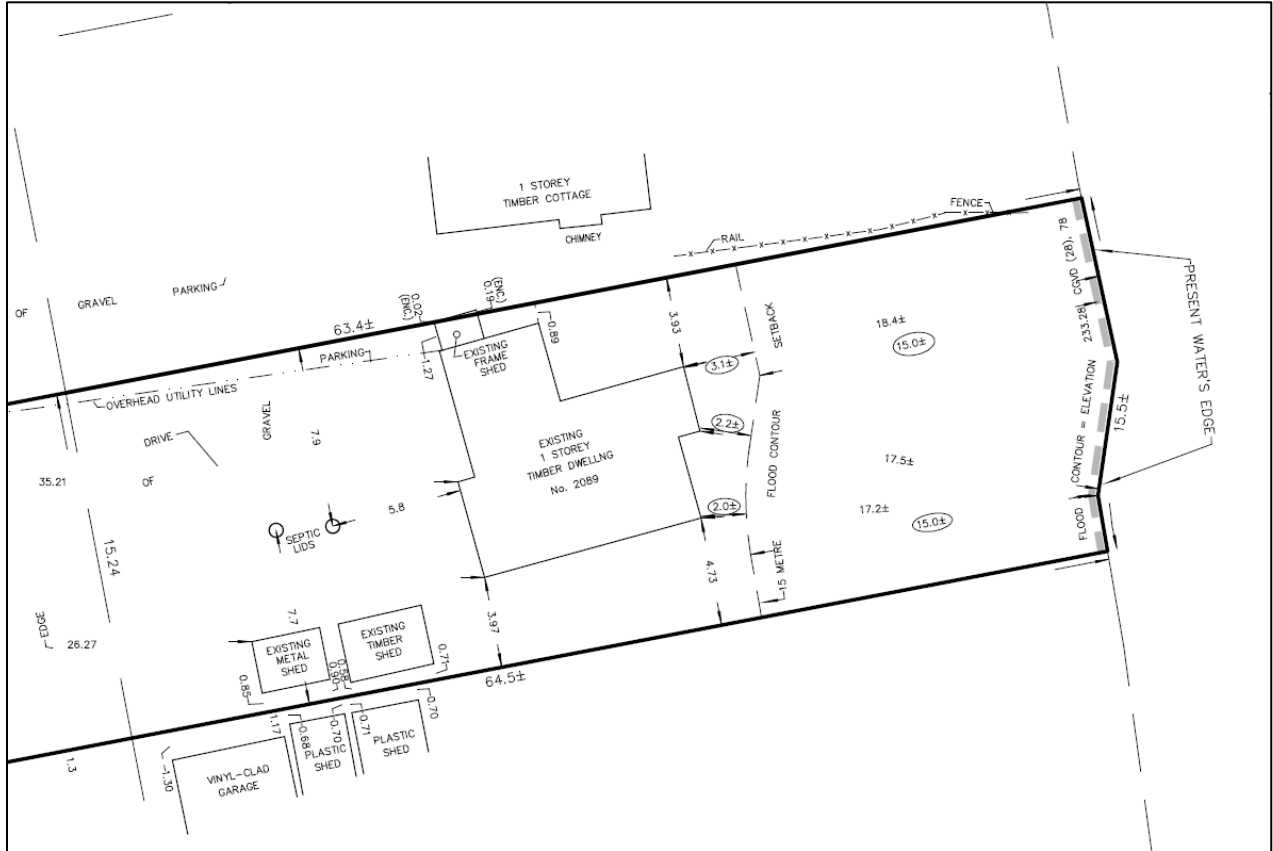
Excerpt Site Plan, JBF Surveyors, Sept 2025
